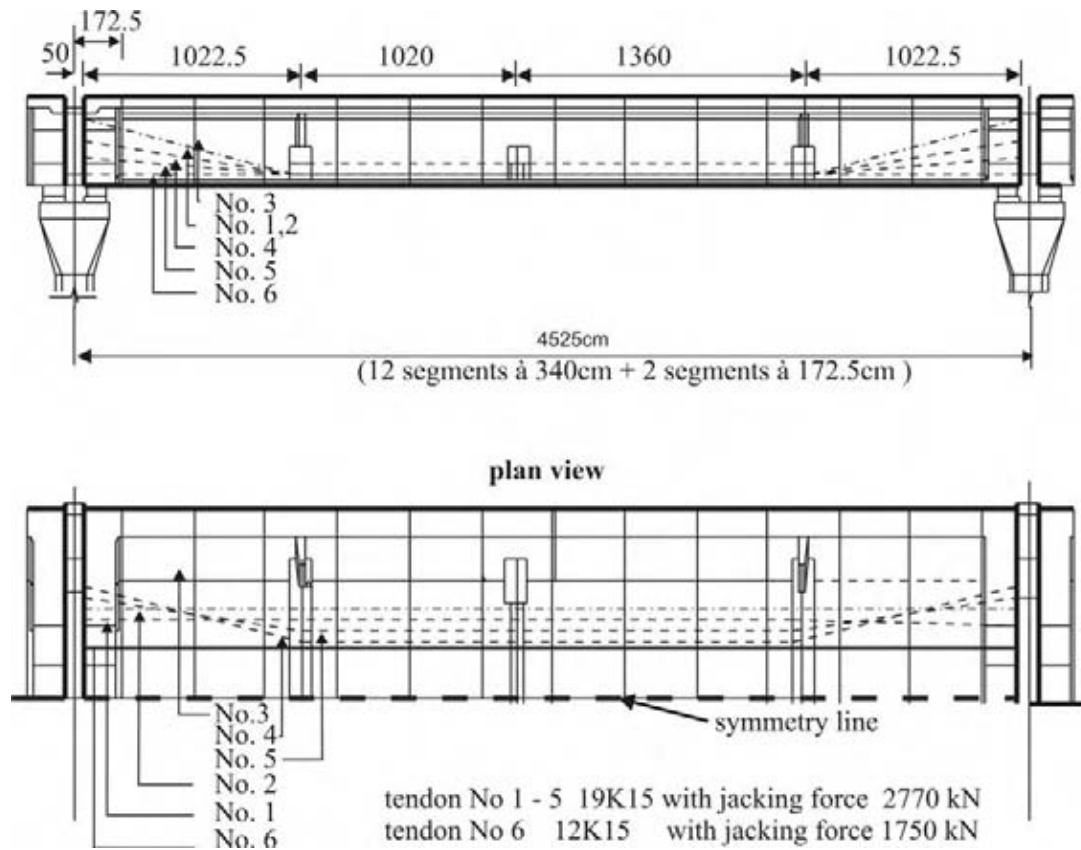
External prestressed segmental bridge (SES Bangkok) [Ro1]
